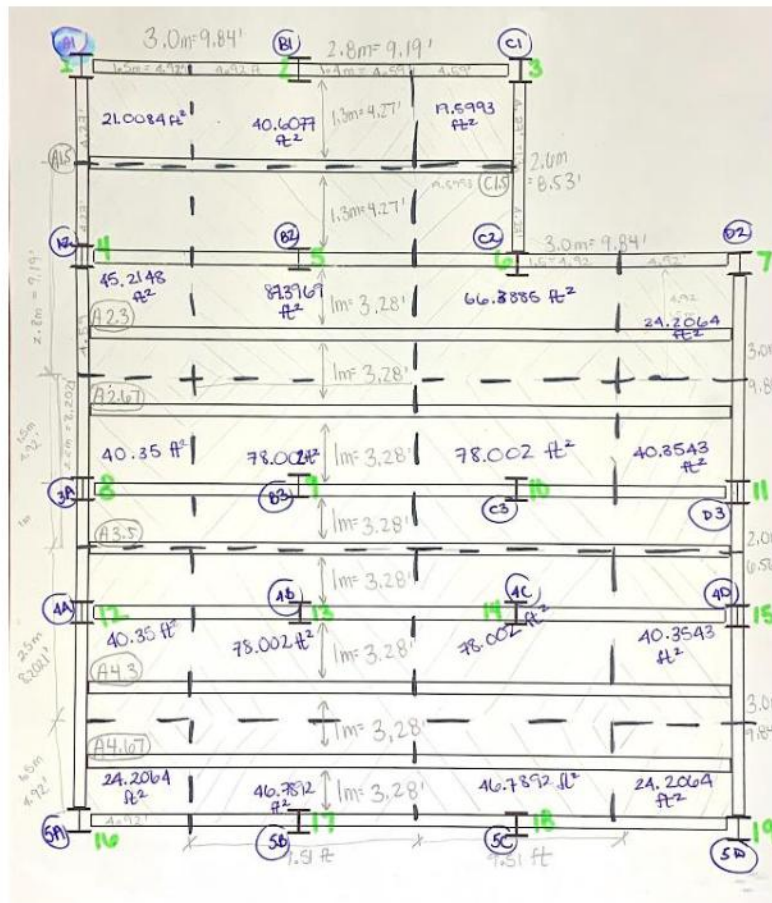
Structural layout of the dormitory illustrating the placement of columns and beams.
